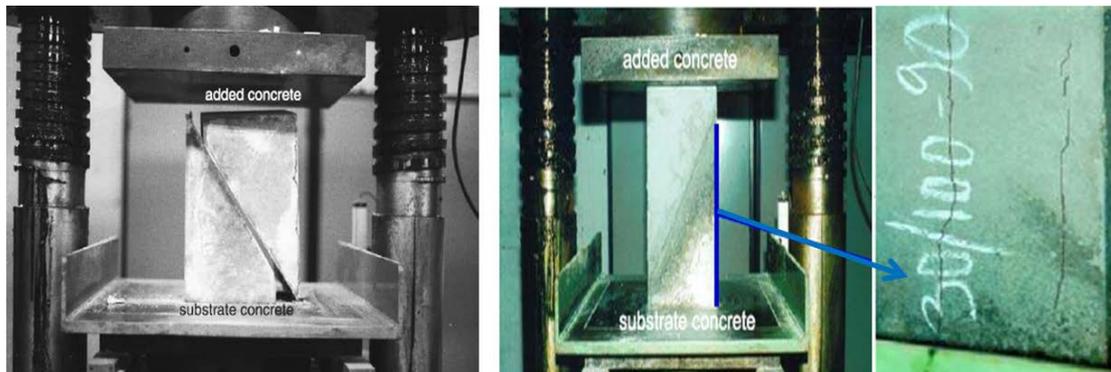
a) Adhesive rupture mode of 30/30 Slant shear specimens
